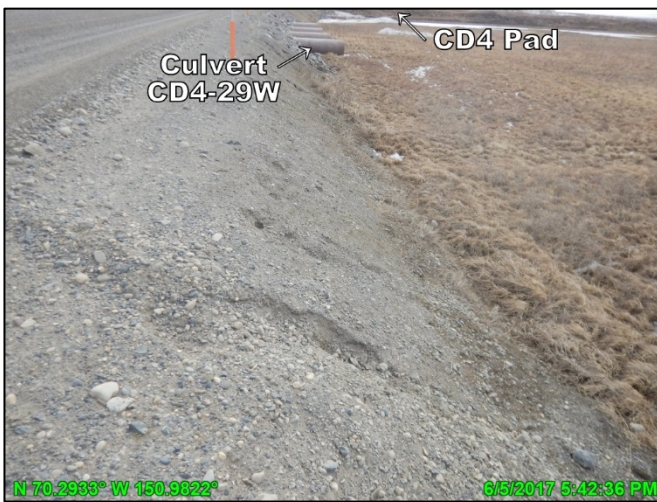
South side of CD4 road near CD4 pad, looking west; June 5, 2017
